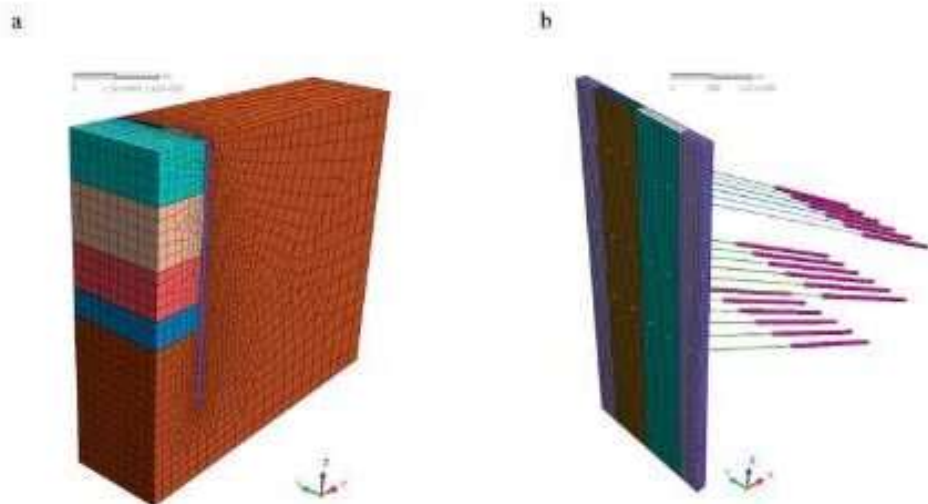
Trench wall design scheme (3D finite element model): a – general configuration, b – an image of anchored trench wall.
